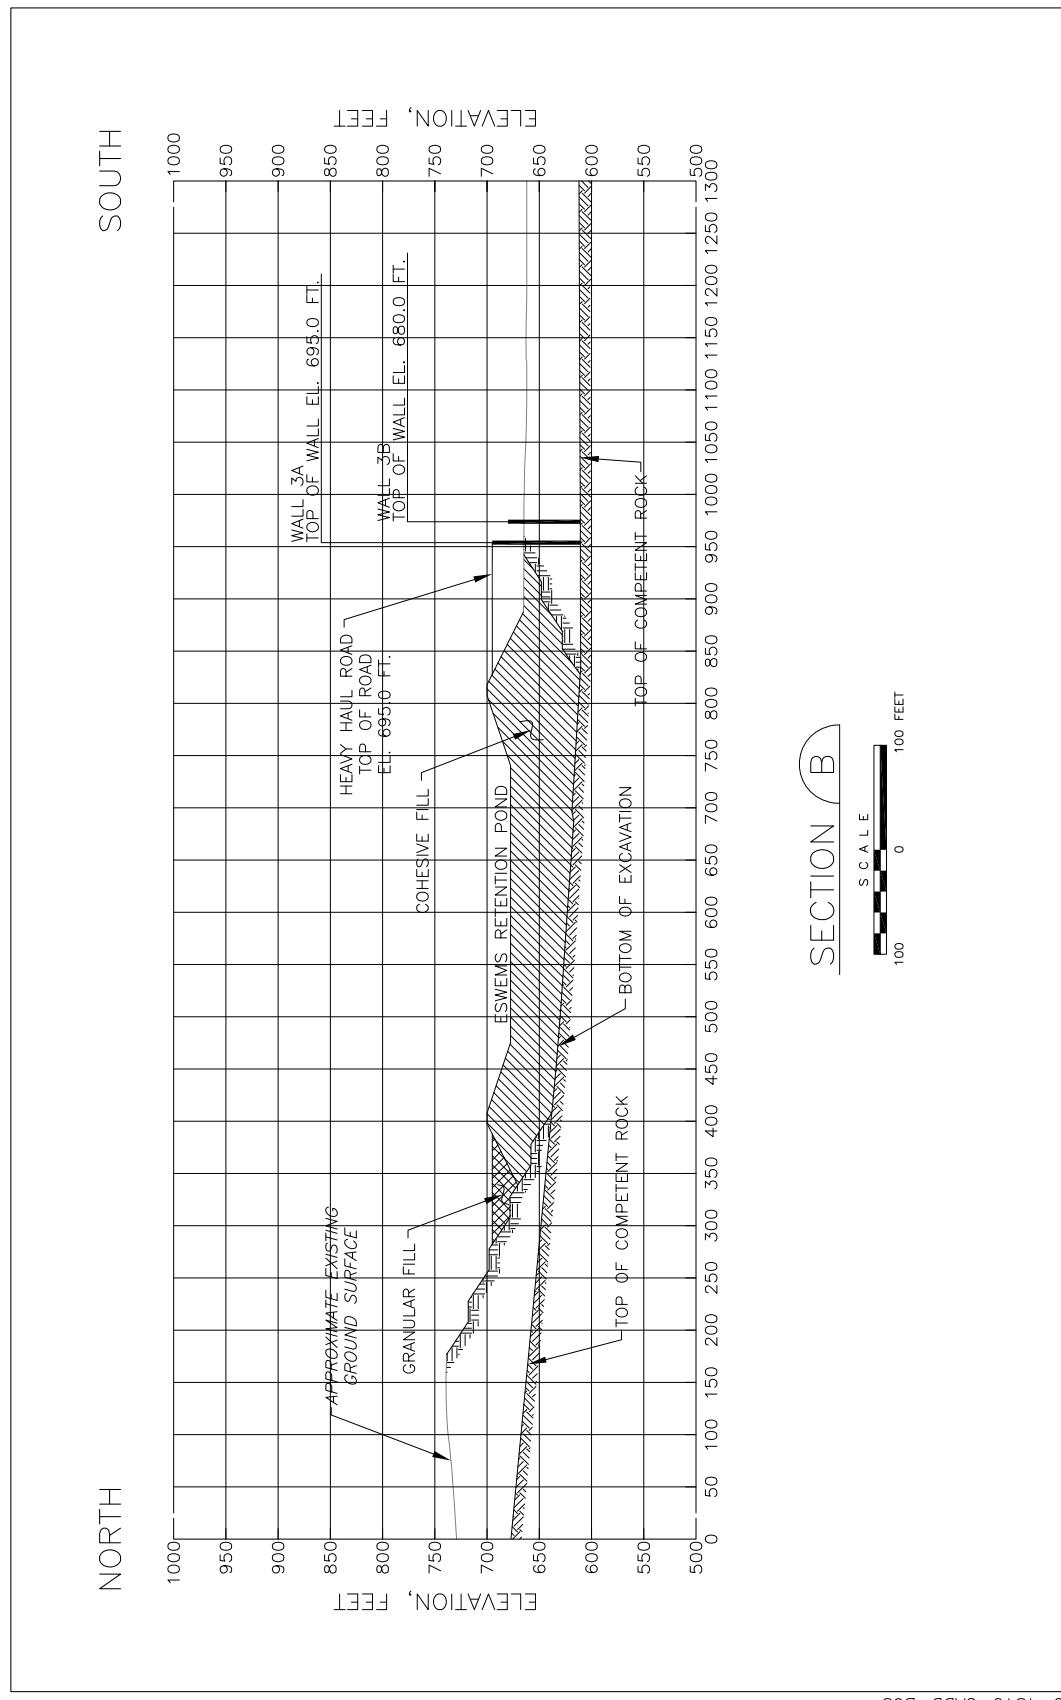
{Permanent Slope Section B, ESWEMS Retention Pond}
